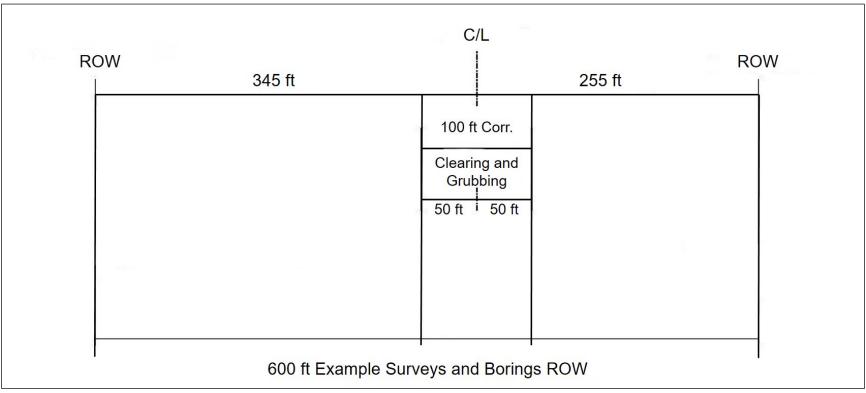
Plan view drawing of a typical ROW for the Proposed Action.
